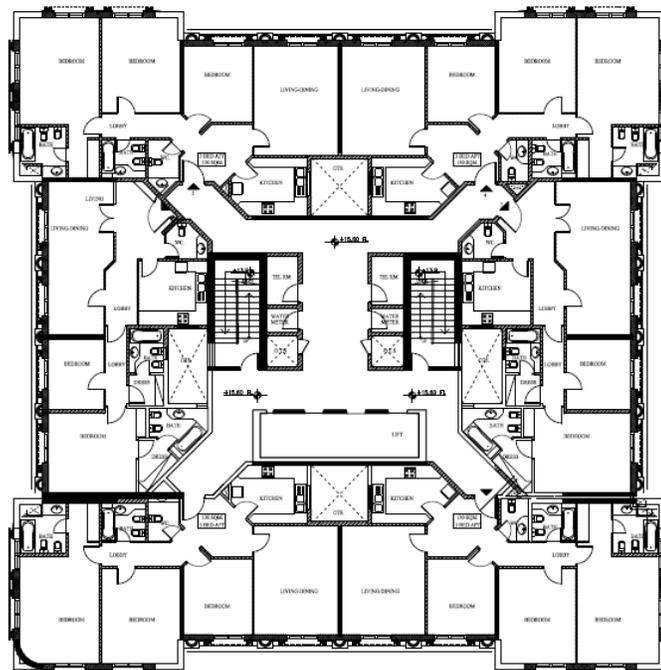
Typical floor plan.(Image source: CAD drawing)
